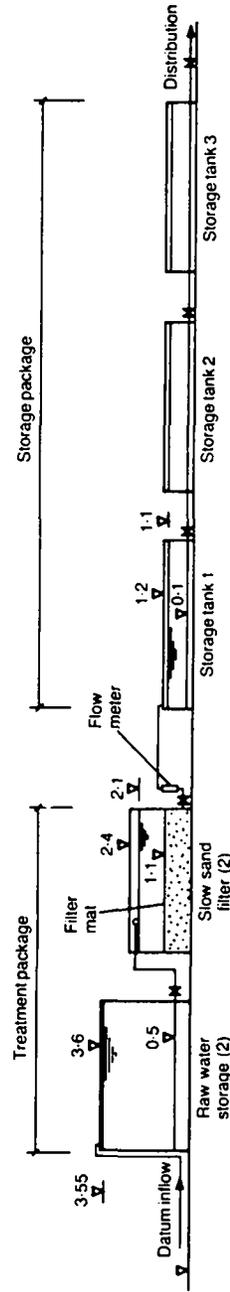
Section of the Oxfam/Imperial College water treatment package
